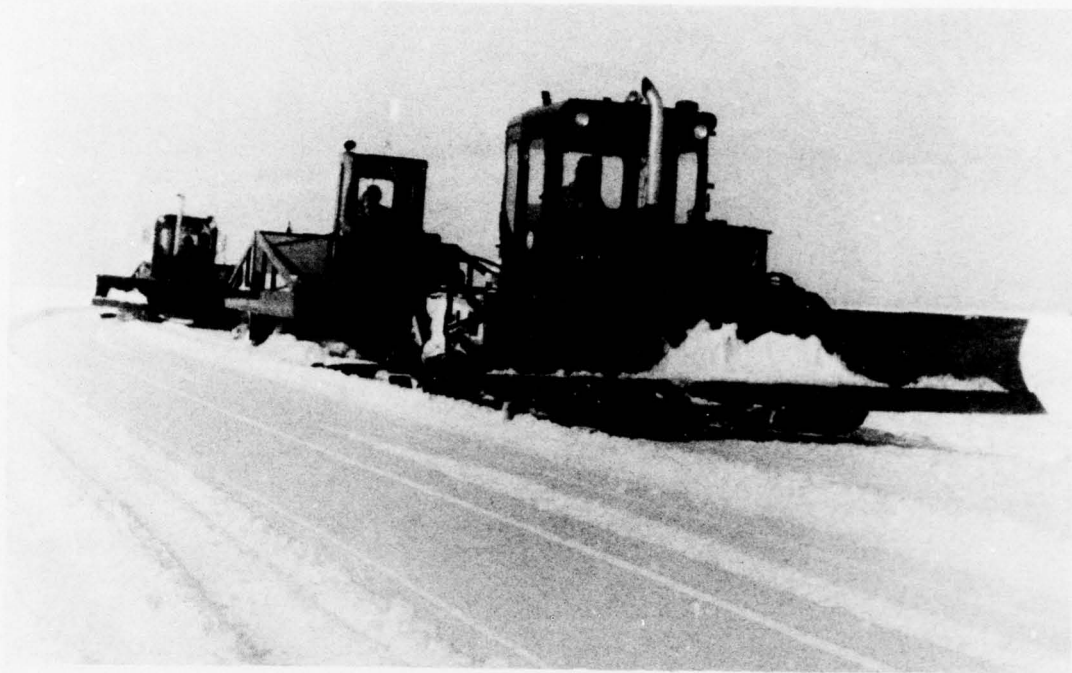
D4 tractor pulling pulvimixer used in snow road construction.
